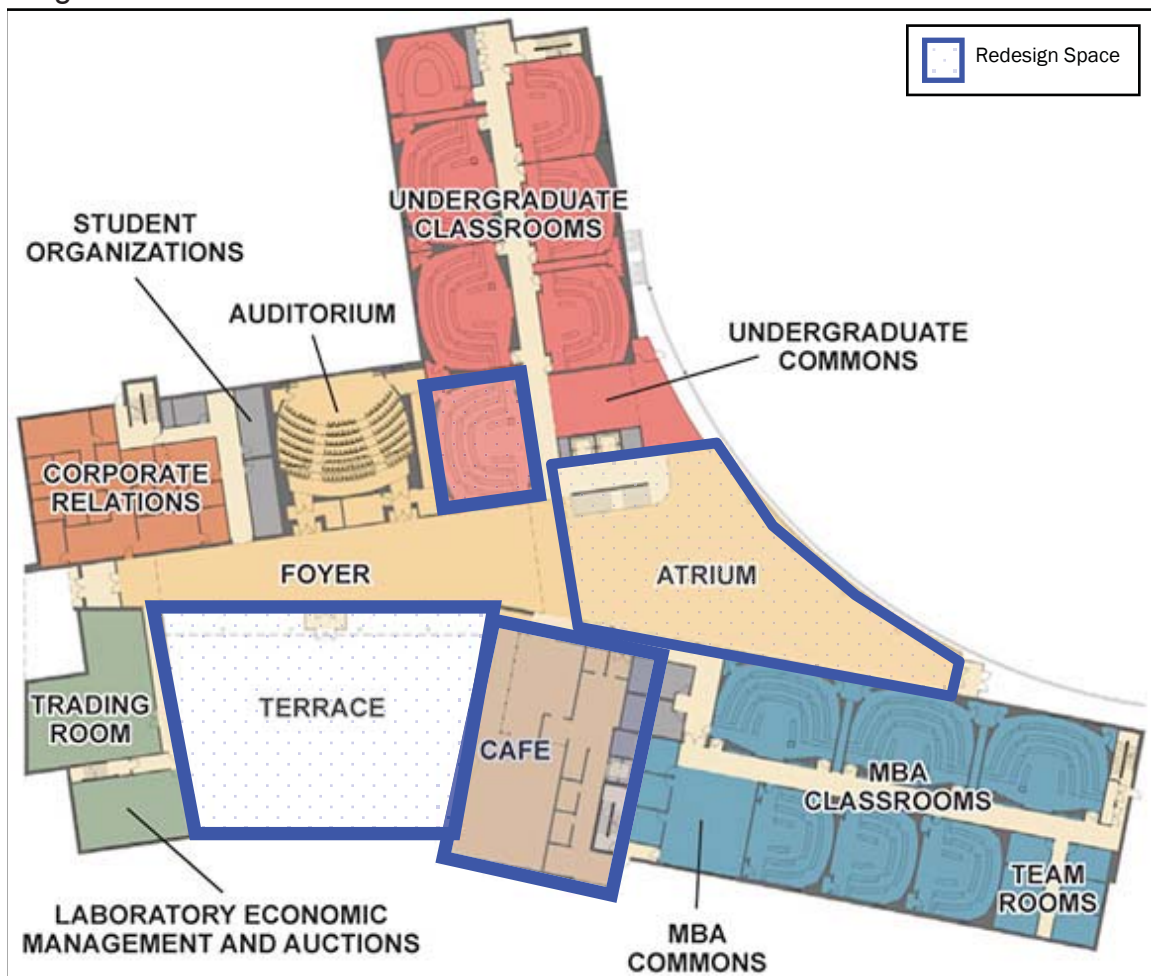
Basic plan view of first floor with thesis spaces highlighted in blue.
